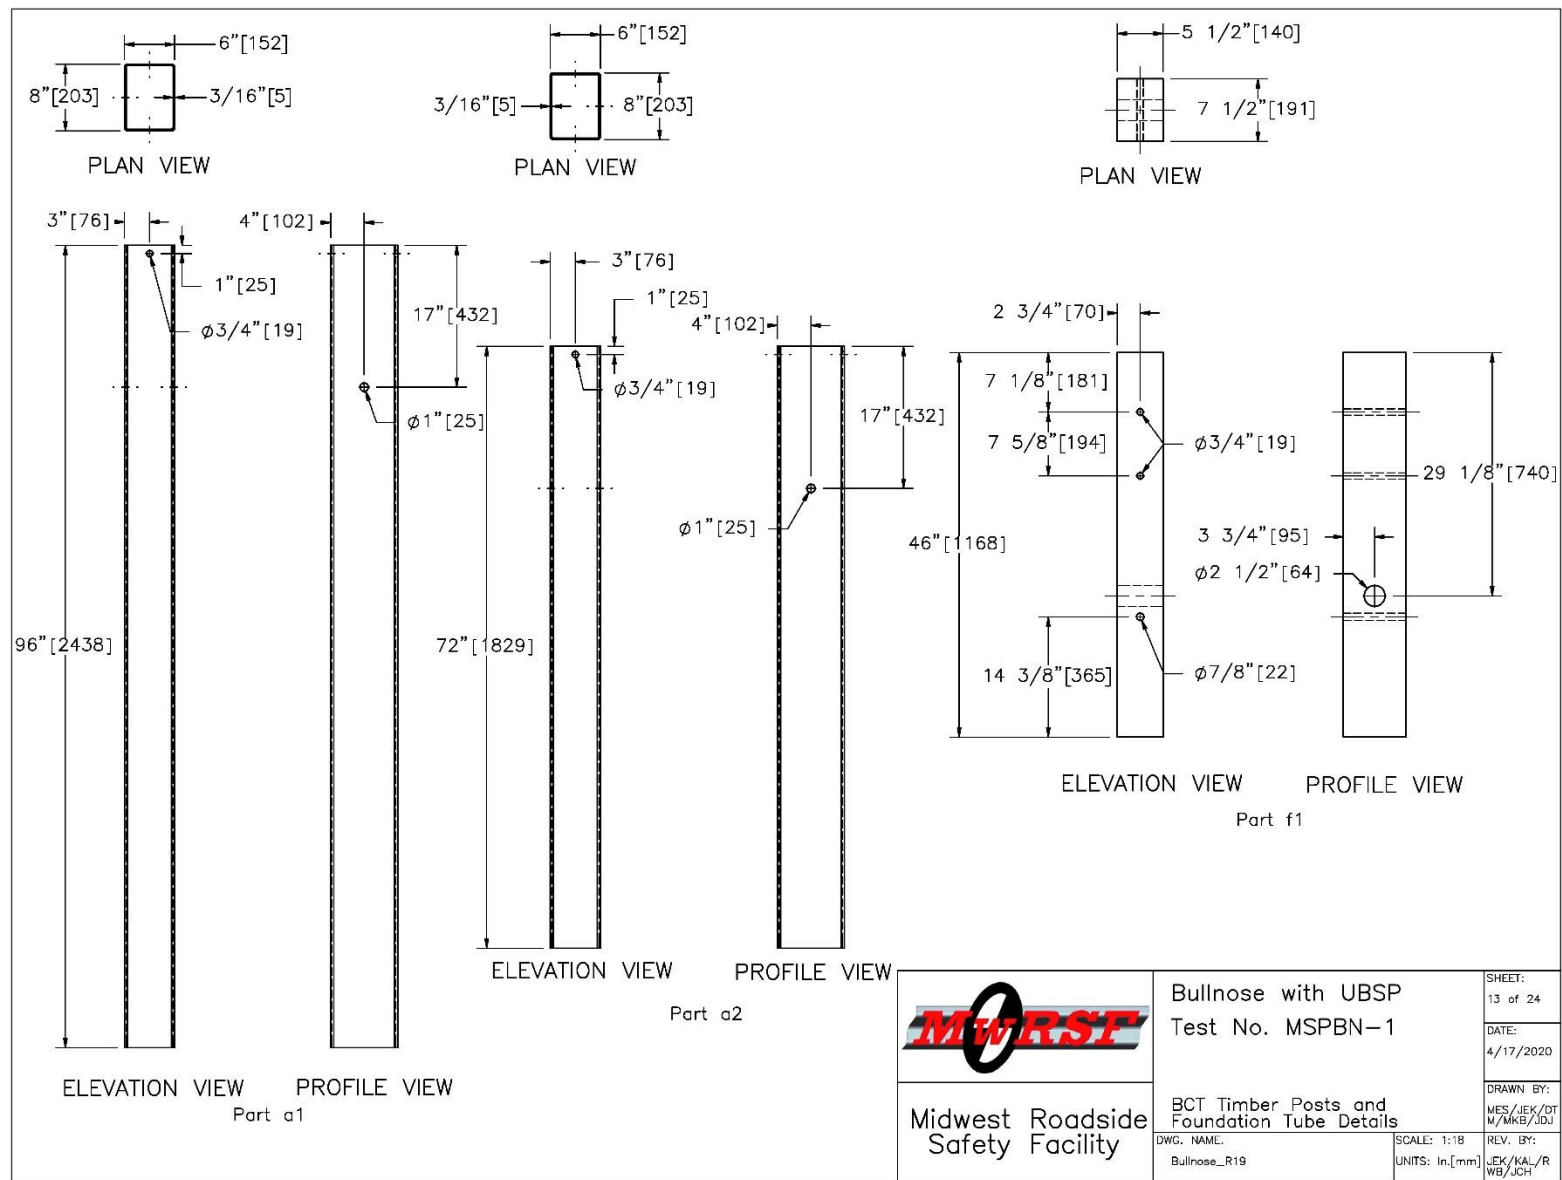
BCT Timber Posts and Foundation Tube Details, Test Nos. MSPBN-1 through MSPBN-3
